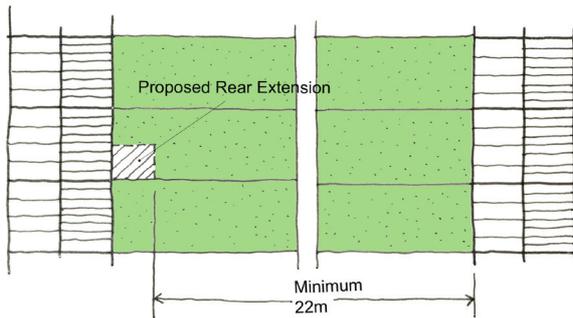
A minimum distance of 22m between rear facing habitable rooms should be maintained where overlooking occurs.
